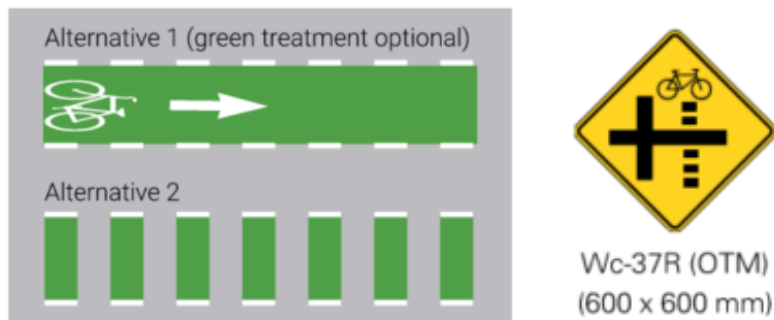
Typical Intersection Crossing Markings and Signage (North Intersection Conflict)
